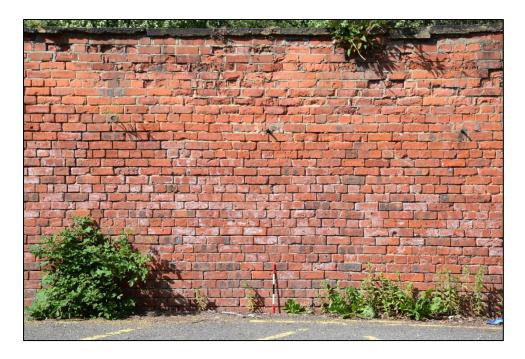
Wall J, north face. Note the difference between the upper courses and the rest of the face
